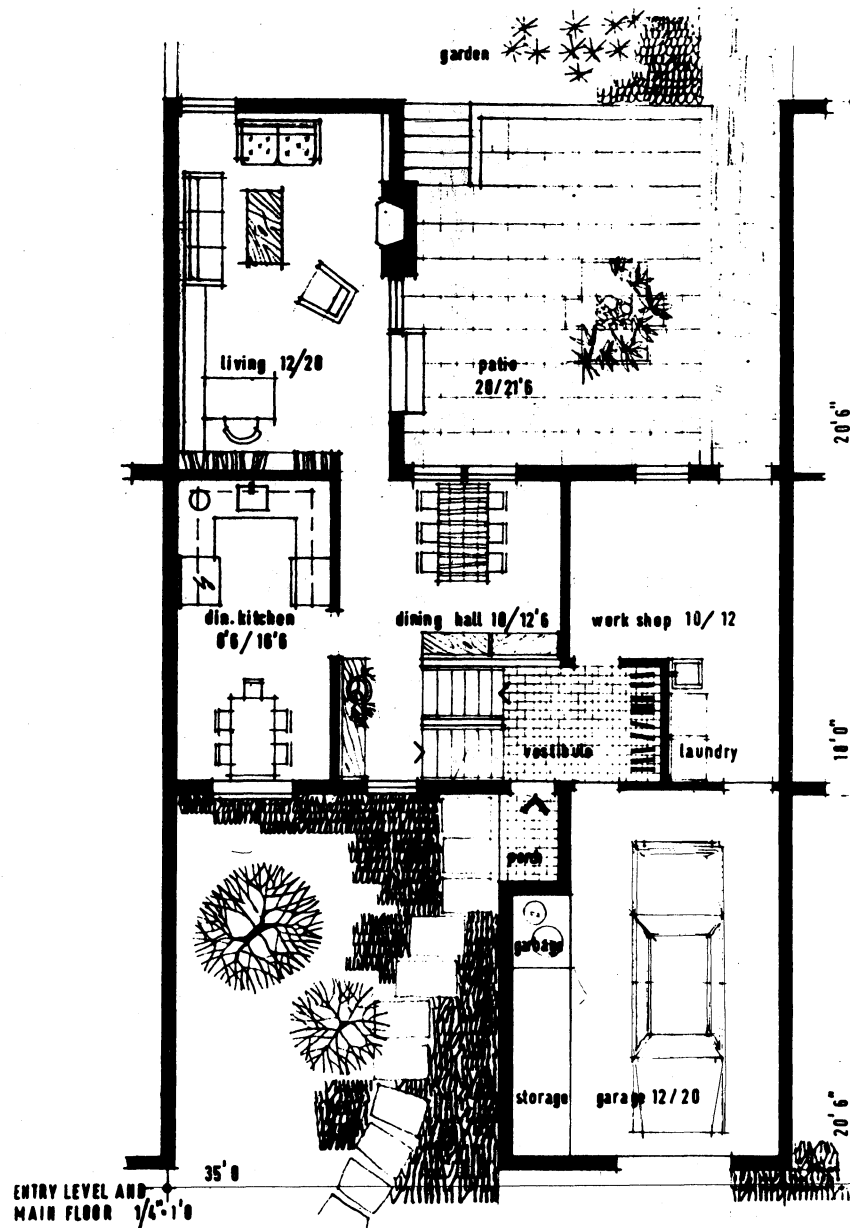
"Court-Yard" House Entry Level and Main Floor Plan
